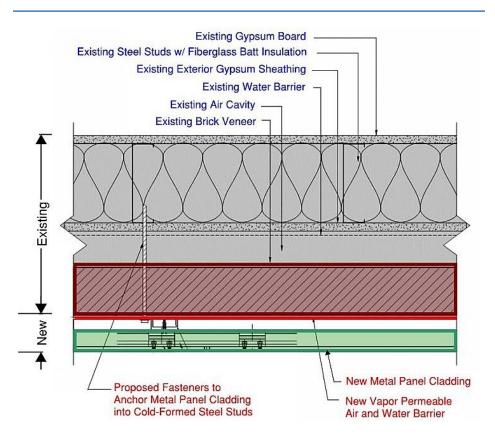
Schematic detail depicting metal panel rainscreen installed over a brick-veneer cavity wall.
